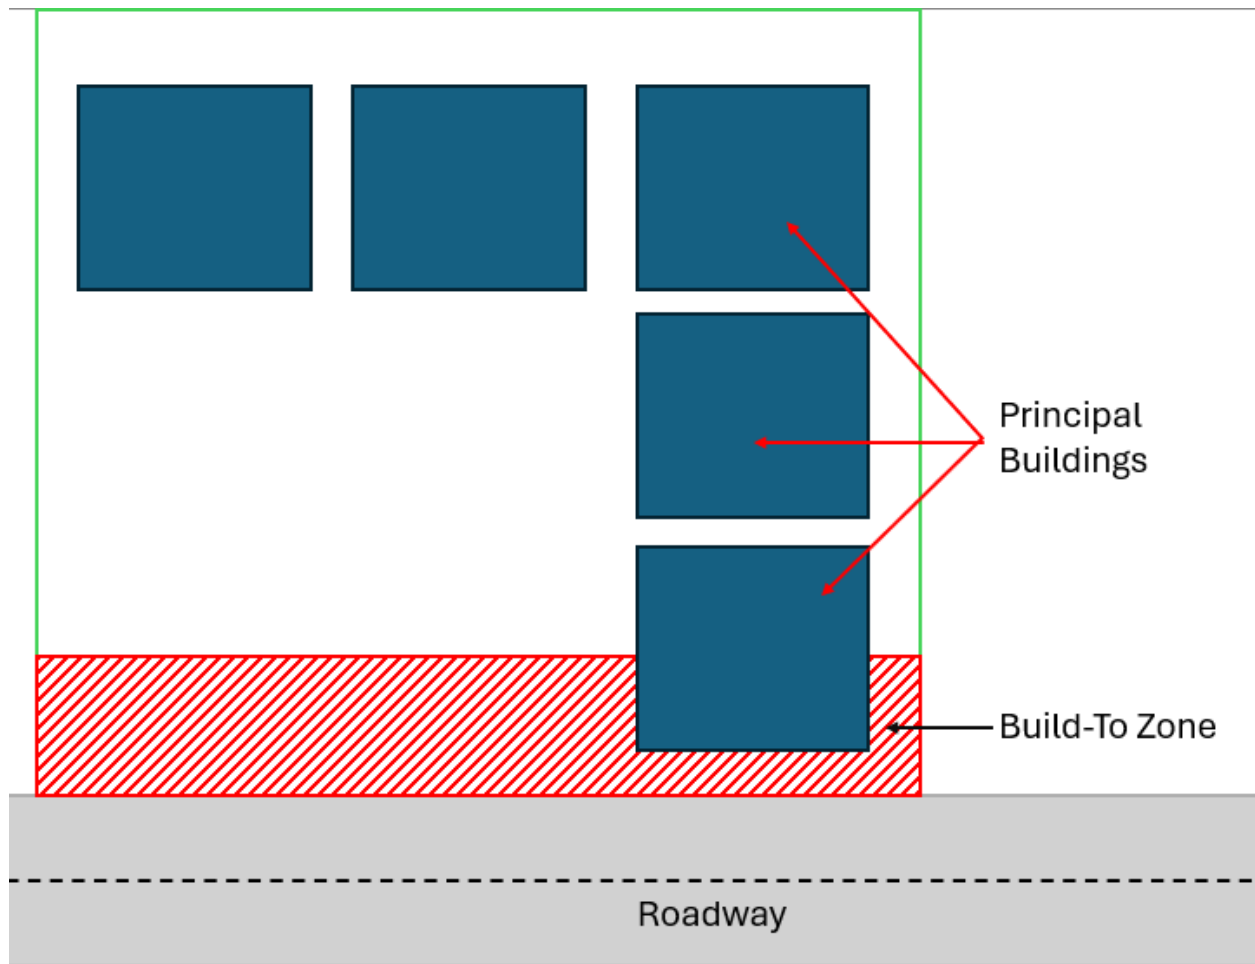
Illustration depicting an undesired result of additional buildings placed behind the first principal building in the Build-To Zone
